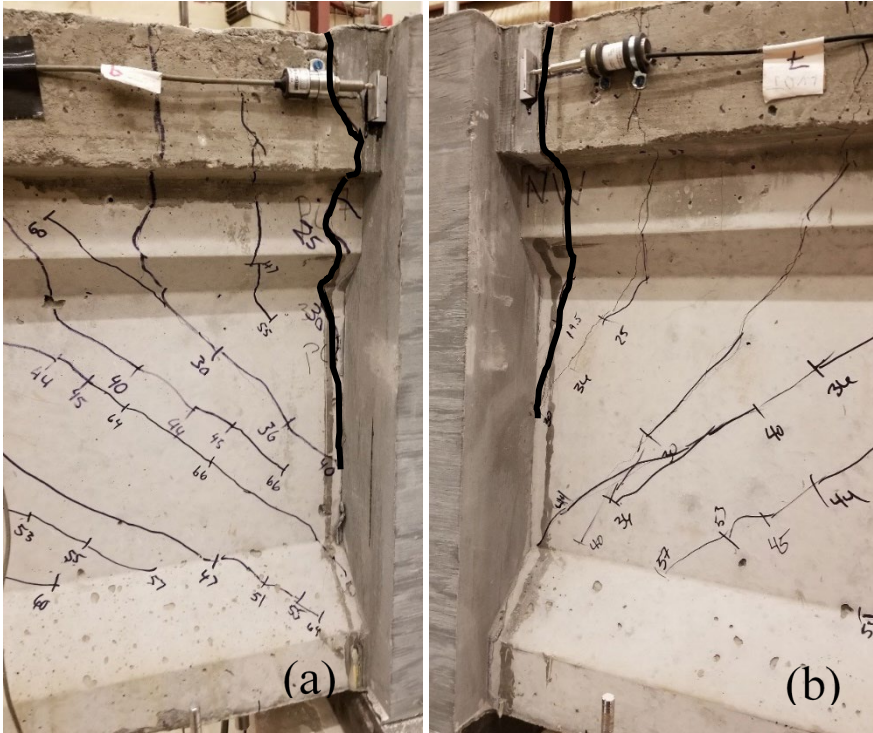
Joint separation at the interface between the RC2-N concrete deck and the UHPC joint with the flexural crack going vertically down in the girder (a) and joint separation at the interface between the RC2-S concrete deck and the UHPC joint with the flexural crack going vertically down in the girder (b) are indicated by dark lines.
